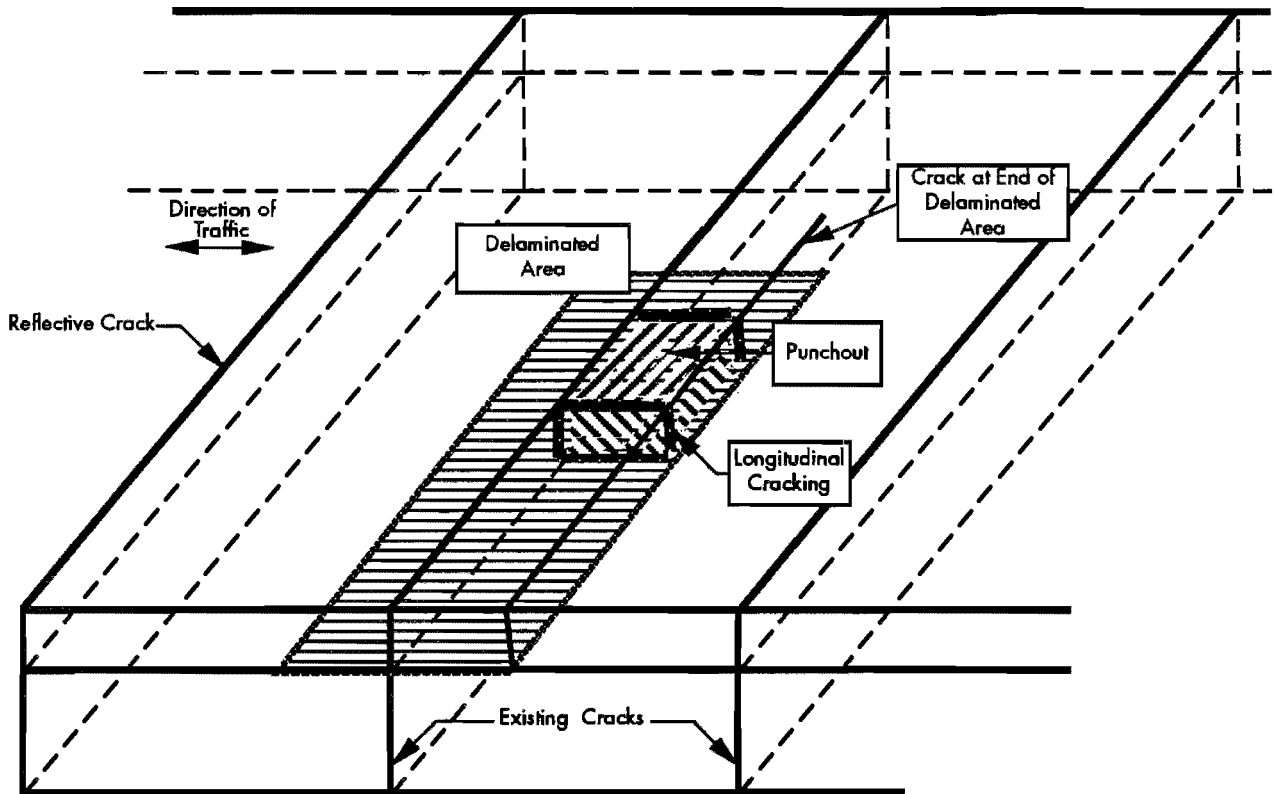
Longitudinal cracking development and punchout failure in delaminated areas
